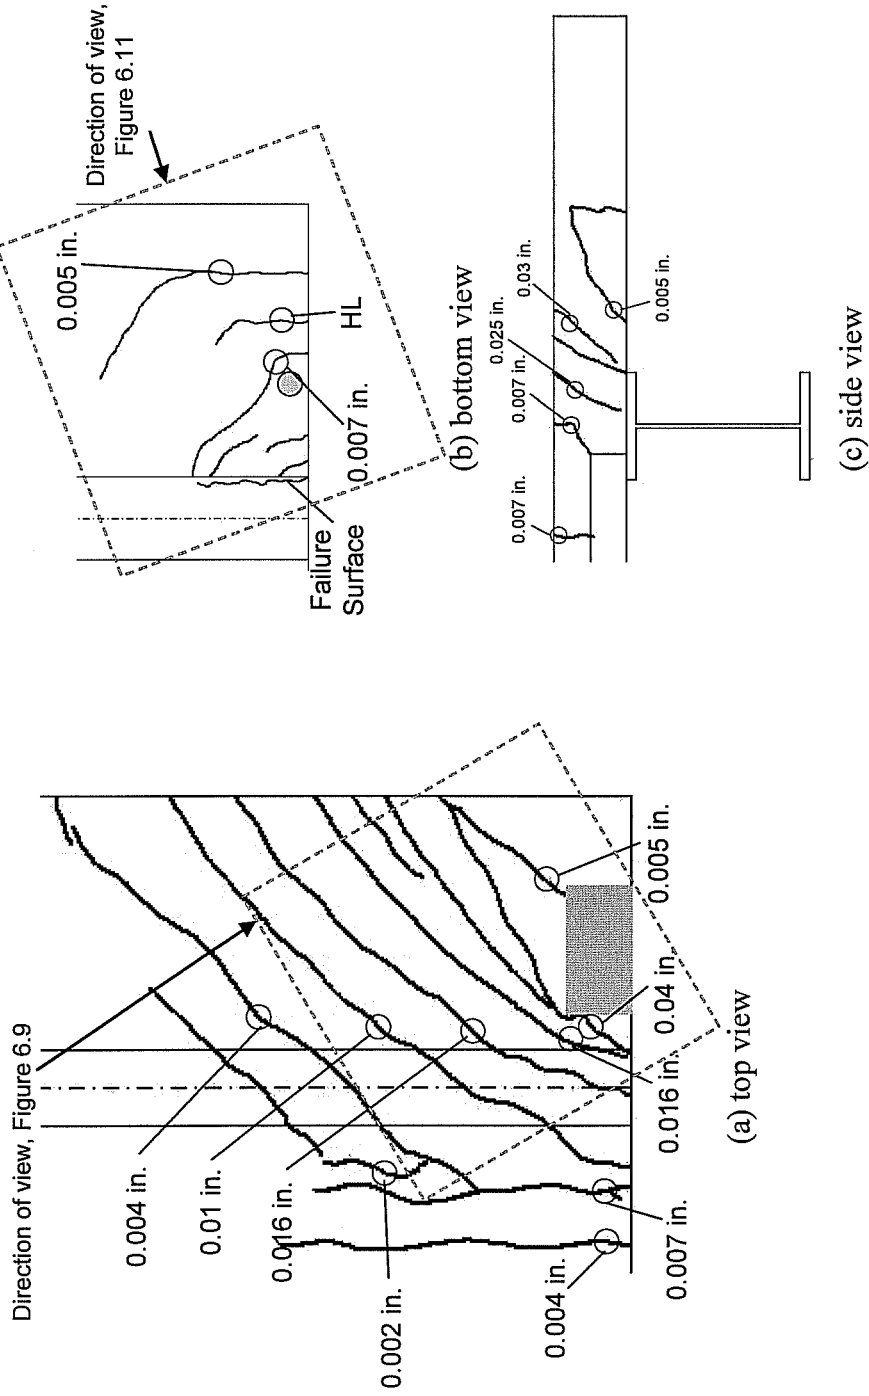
Crack map at failure, Overhang Test Area 1, 3-7/8 in. top reinforcement spacing: (a) top view; (b) bottom view; (c) side view, facing north
